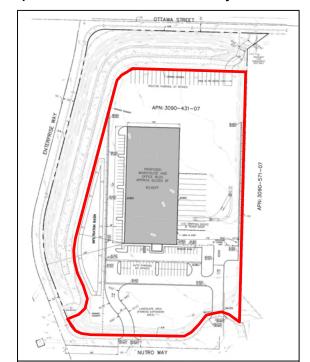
Site Plan – Proposed Warehouse and Office Facility – APN 3090-431-07, Victorville, CA
